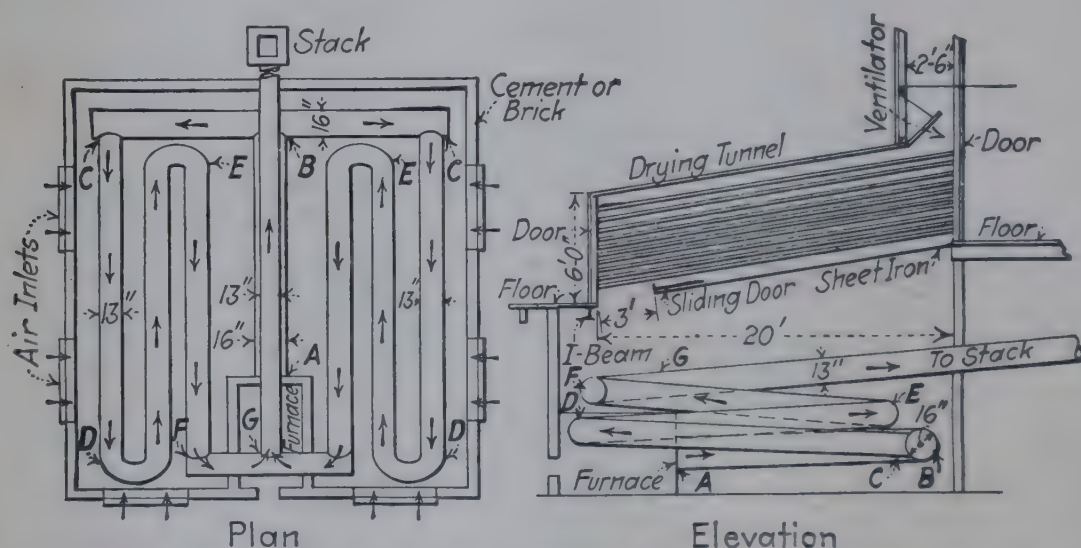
Sketch of Oregon tunnel drier showing arrangement of heating pipes. (After Lewis.)
